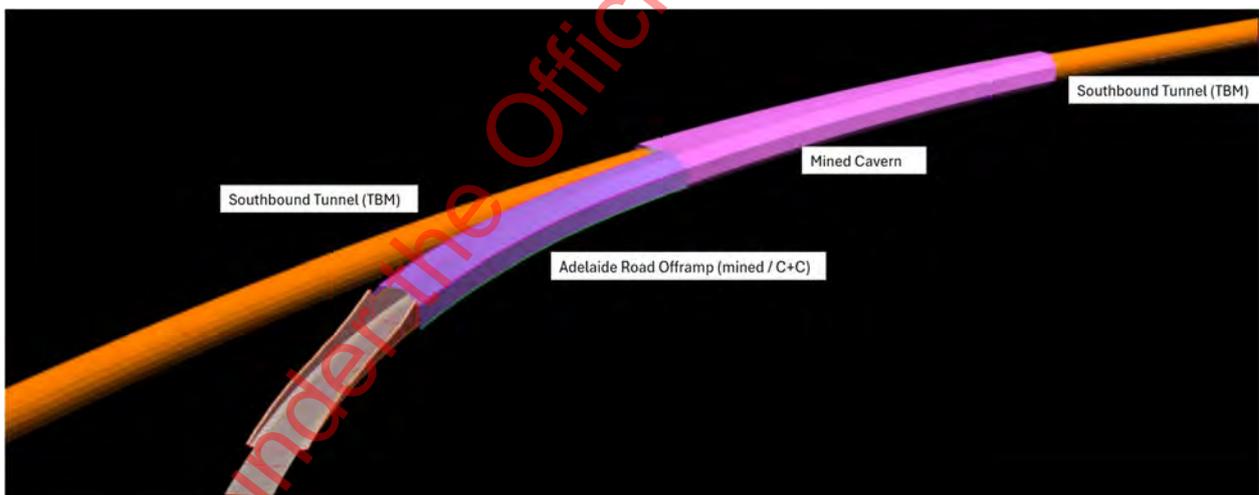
Adelaide Road Off-ramp and Mined Cavern, plus Southbound Tunnel
